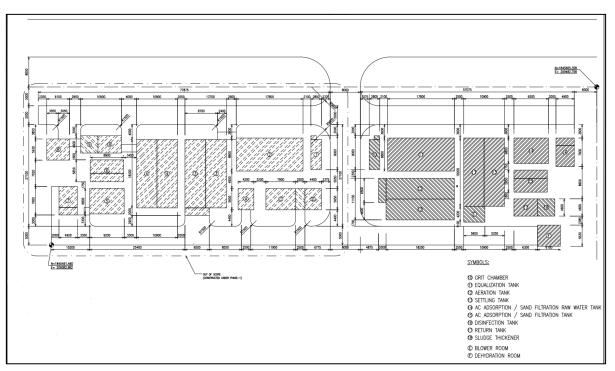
General Layout of Central Effluent Treatment Plant/ Central Sewage Treatment Plant
